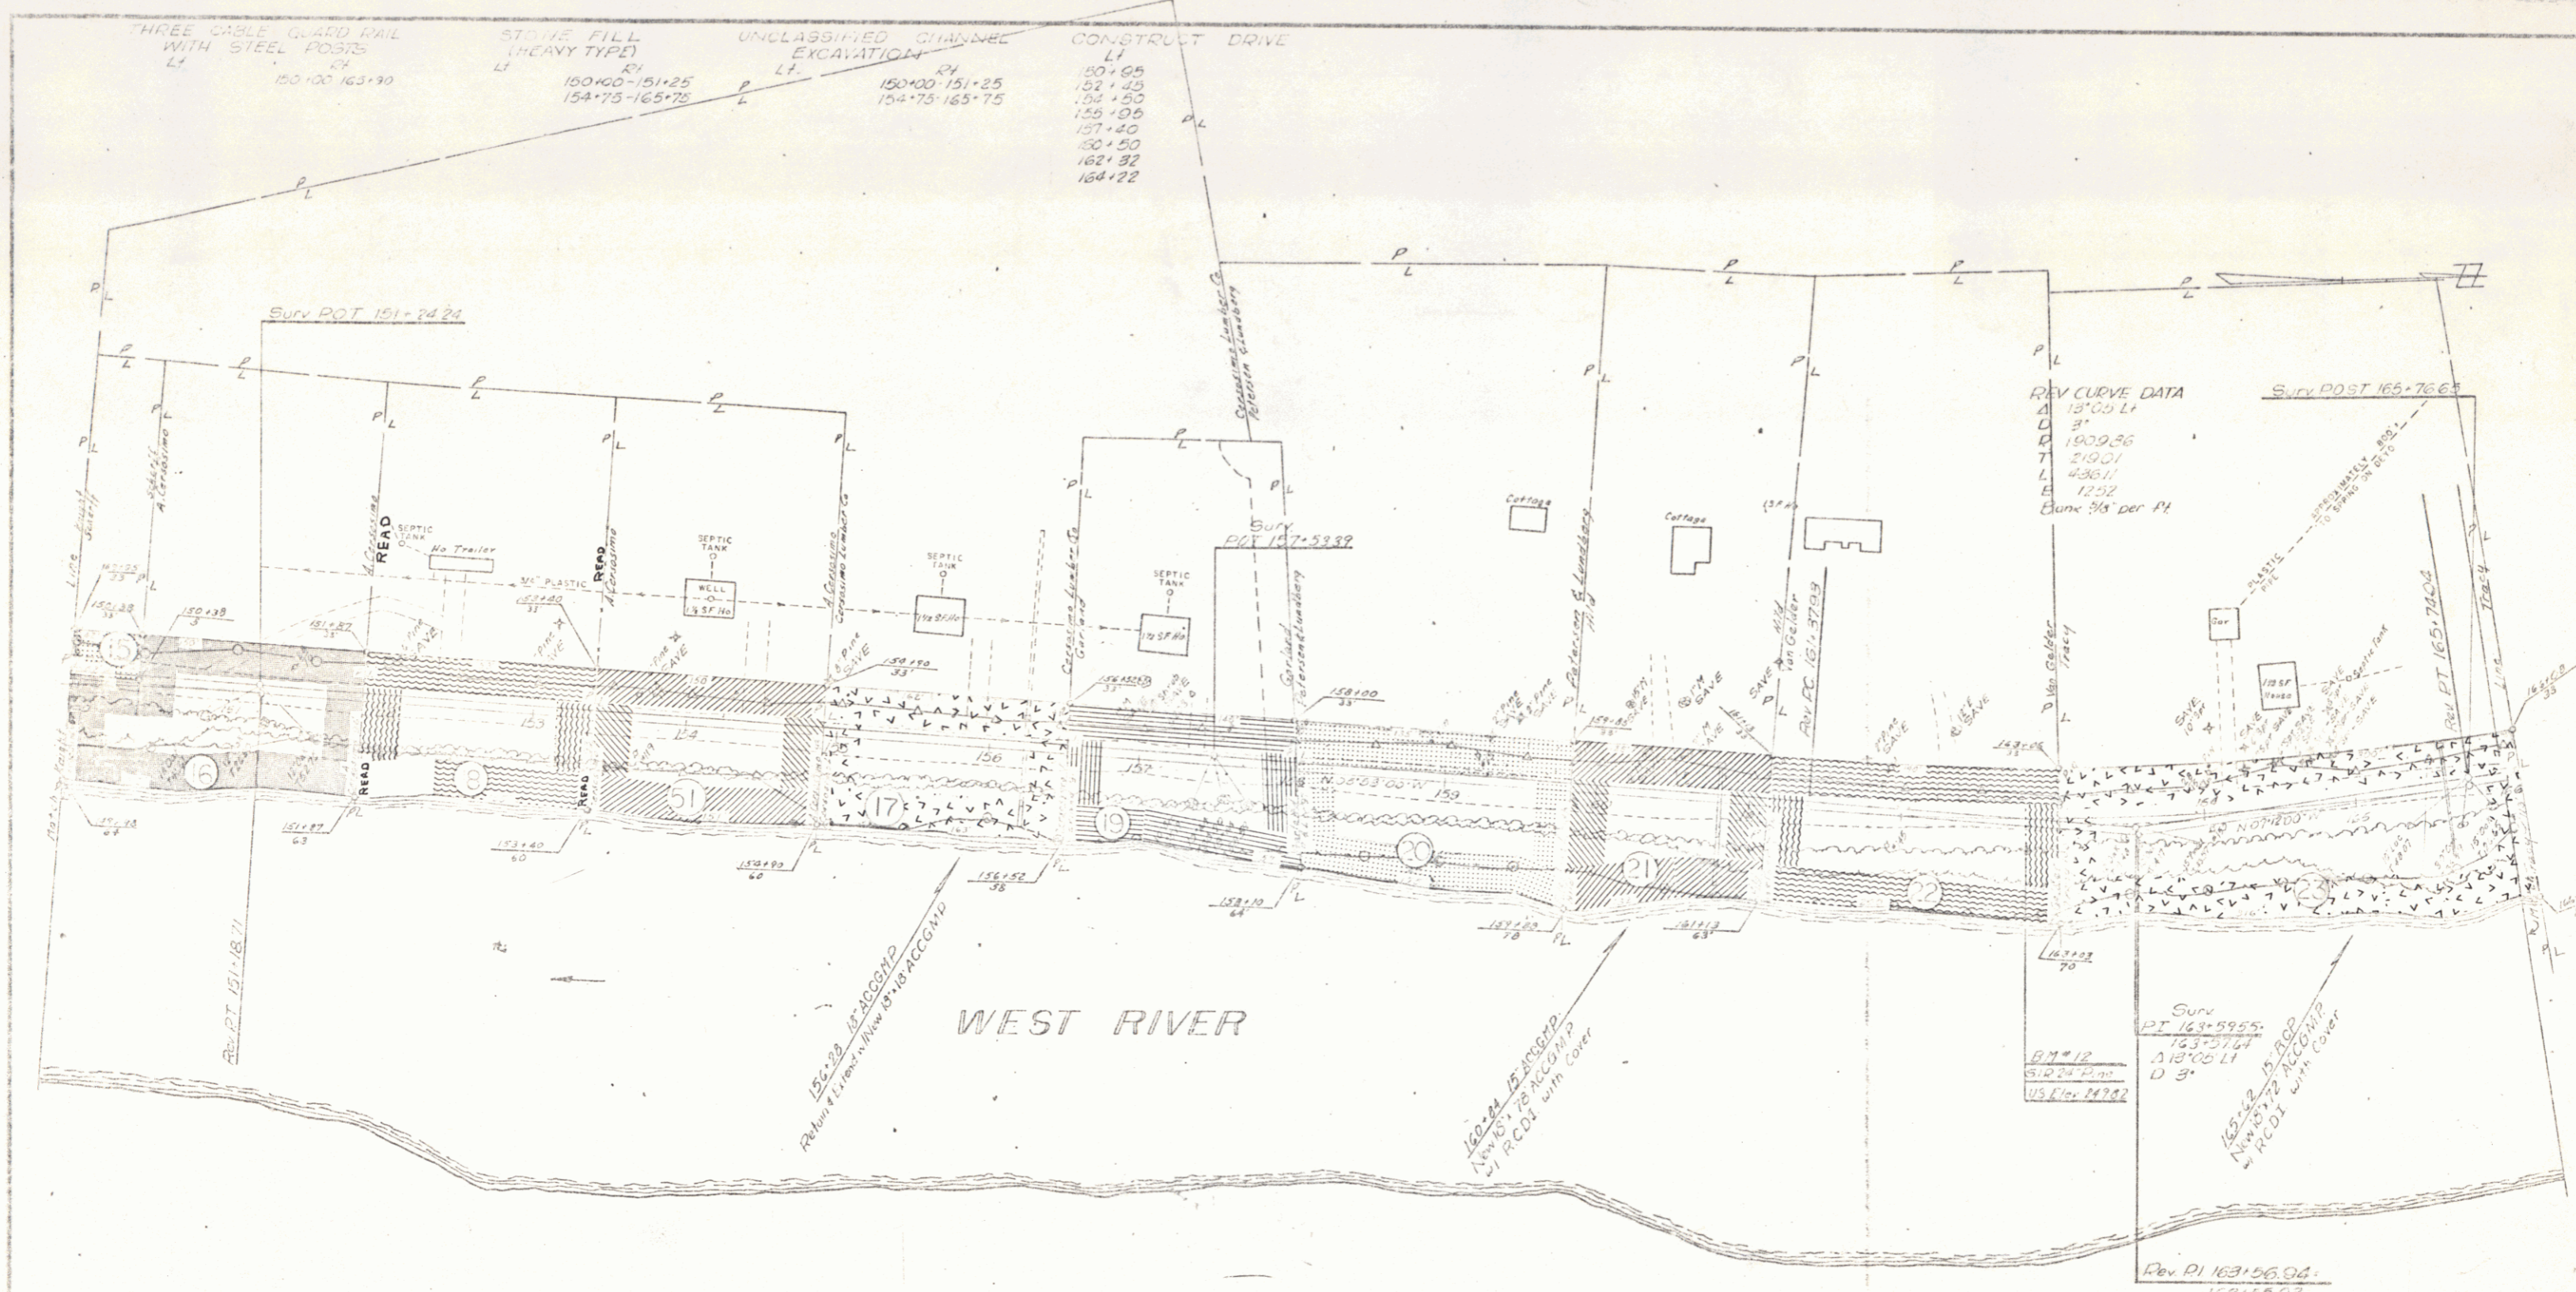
PLAN-PROFILE OF P.A.R. & R.R. STATIONING
